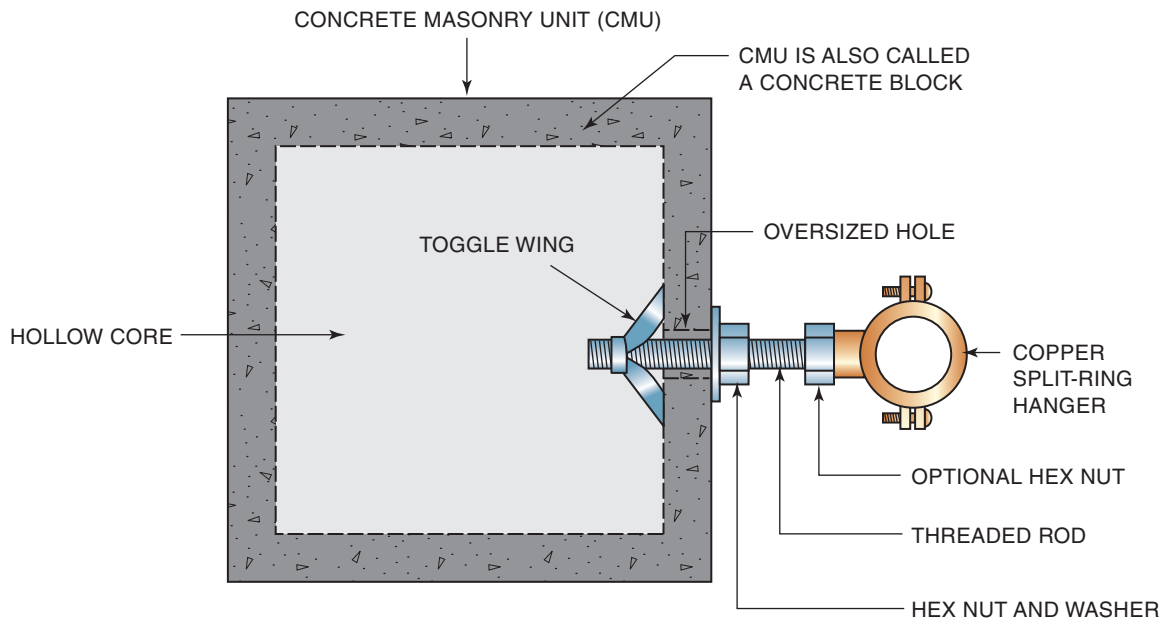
A toggle bolt and threaded rod assembly can be used to install a split-ring hanger to a concrete masonry unit.
